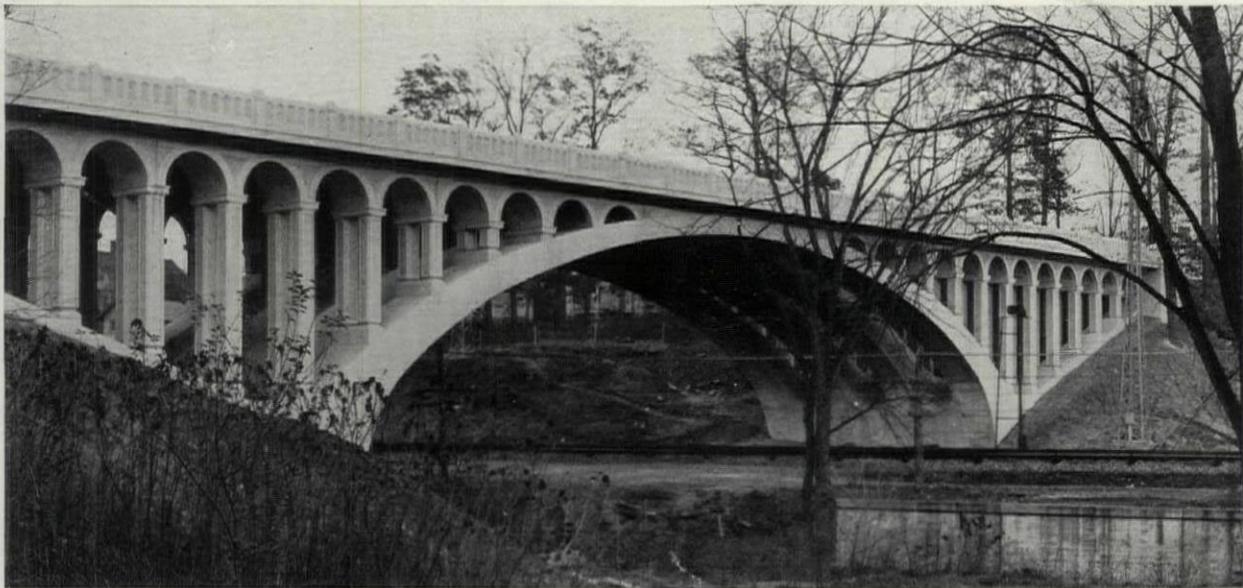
Reinforced Concrete Bridge, Bronx River Parkway, near White Plains, N. Y.
